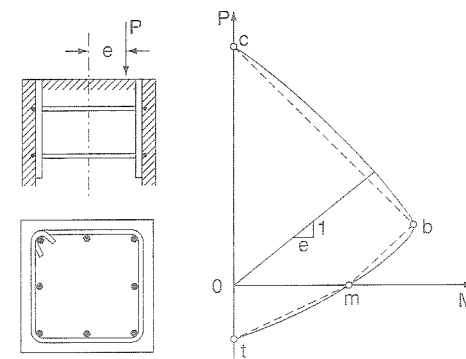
Cross-section of a tied reinforced concrete column and its failure envelope (interaction diagram)
